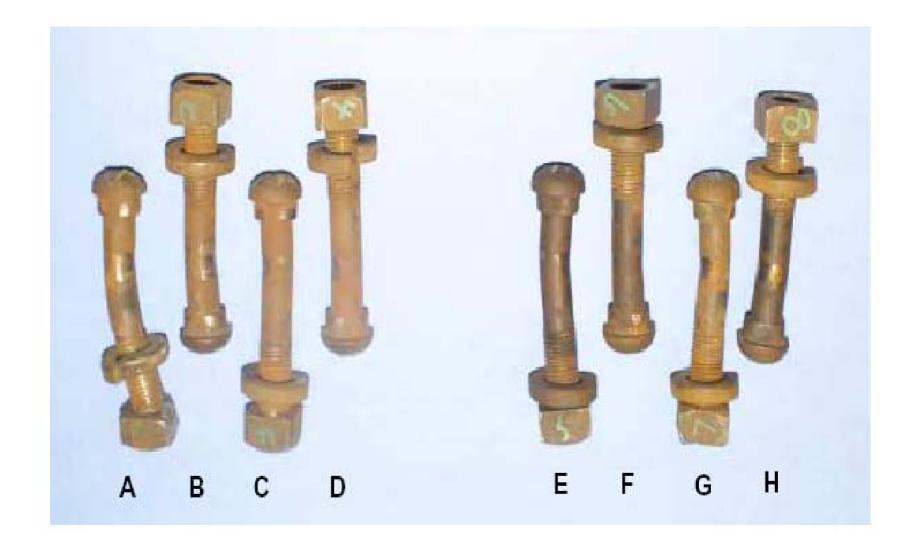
The eight bolts that fastened the joint bars. The disassembled bolts, washers, and nuts are positioned as they were when in place. Note that the shank portion of the bolts that are bent away from their rail joints. West is on the left side of photograph.
